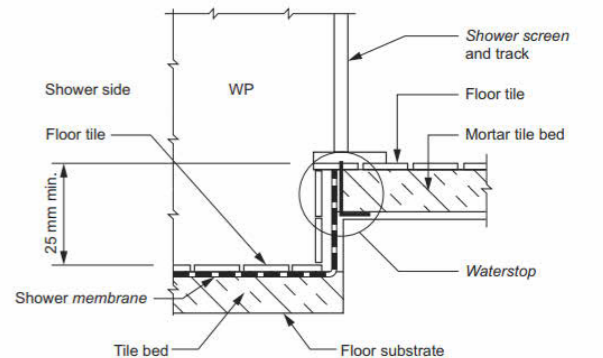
Typical unenclosed stepped down shower construction (membrane below tile bed)
